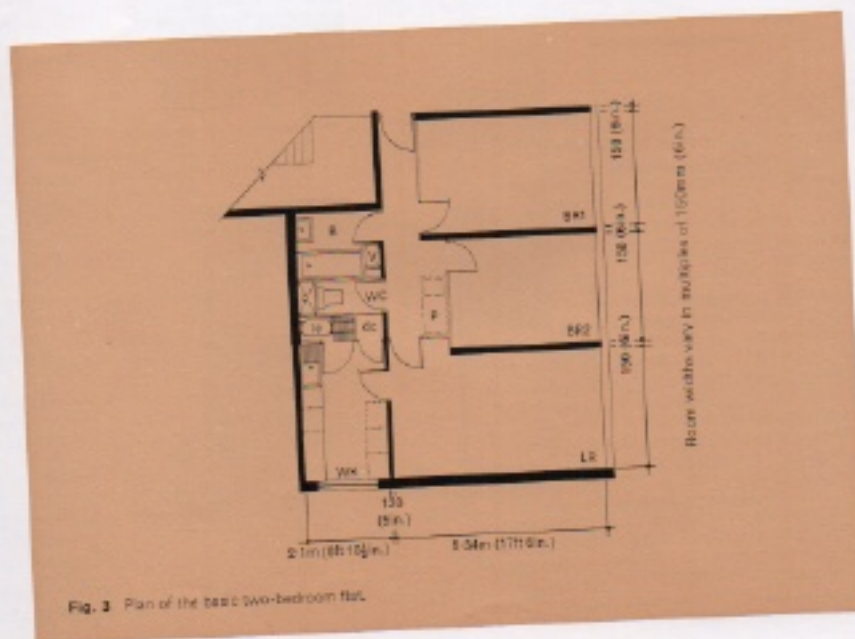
give some indication of how these can be arranged. Fig. 3 is a plan based on theoretical minimum requirements. In practice, local authorities plan their flats to the standard recommended in the Parker Morris report.
